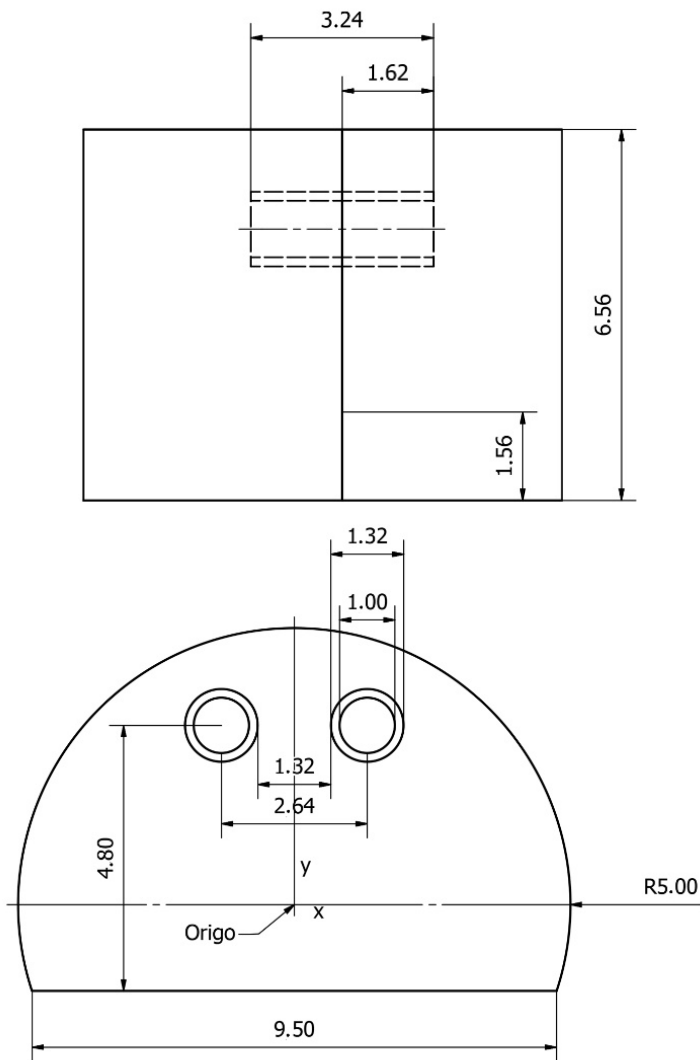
Technical drawing of the cross-section of the simulation model, also showing the dimension and placement of the fan model in relation to the cross-section. Given dimensions are in [m].
